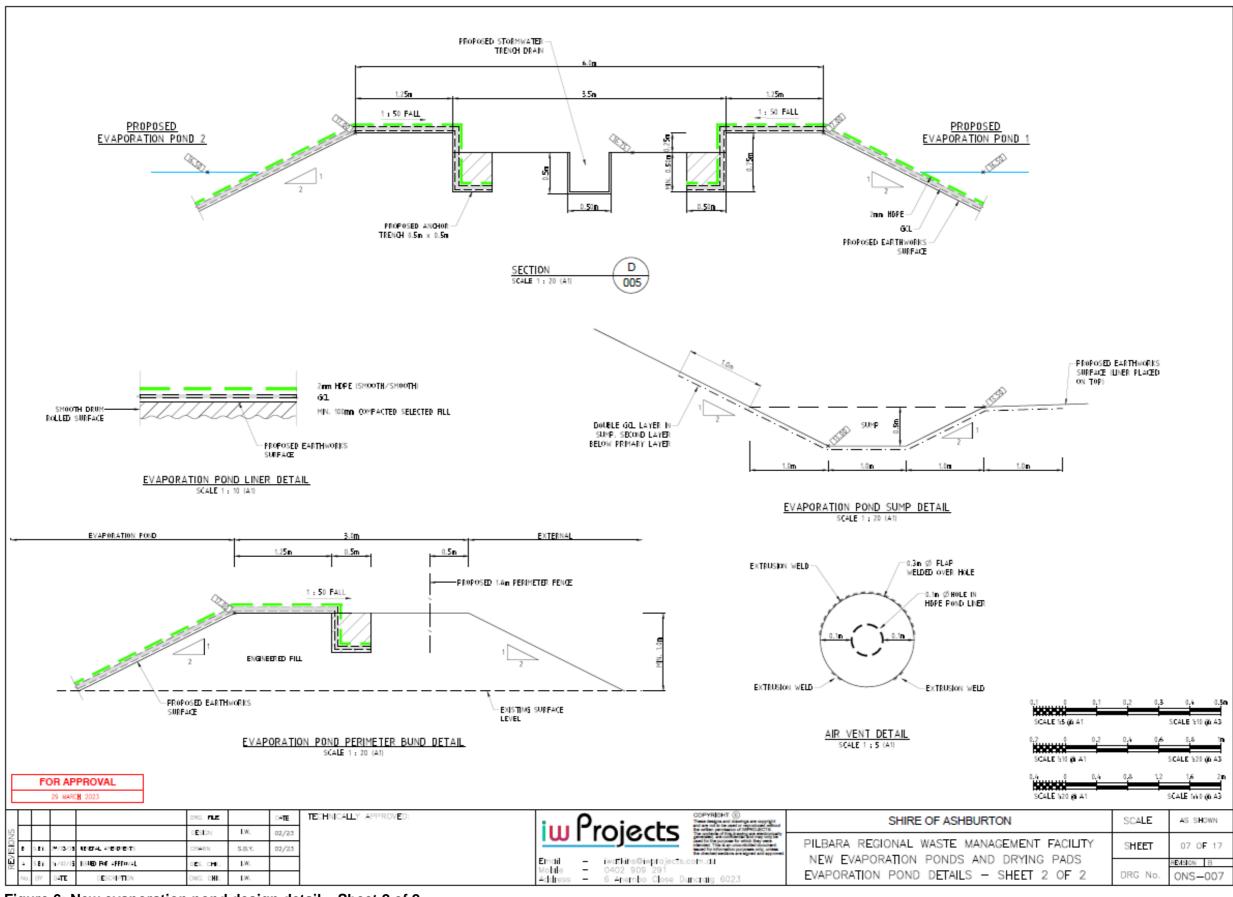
New evaporation pond design detail – Sheet 2 of 2.
